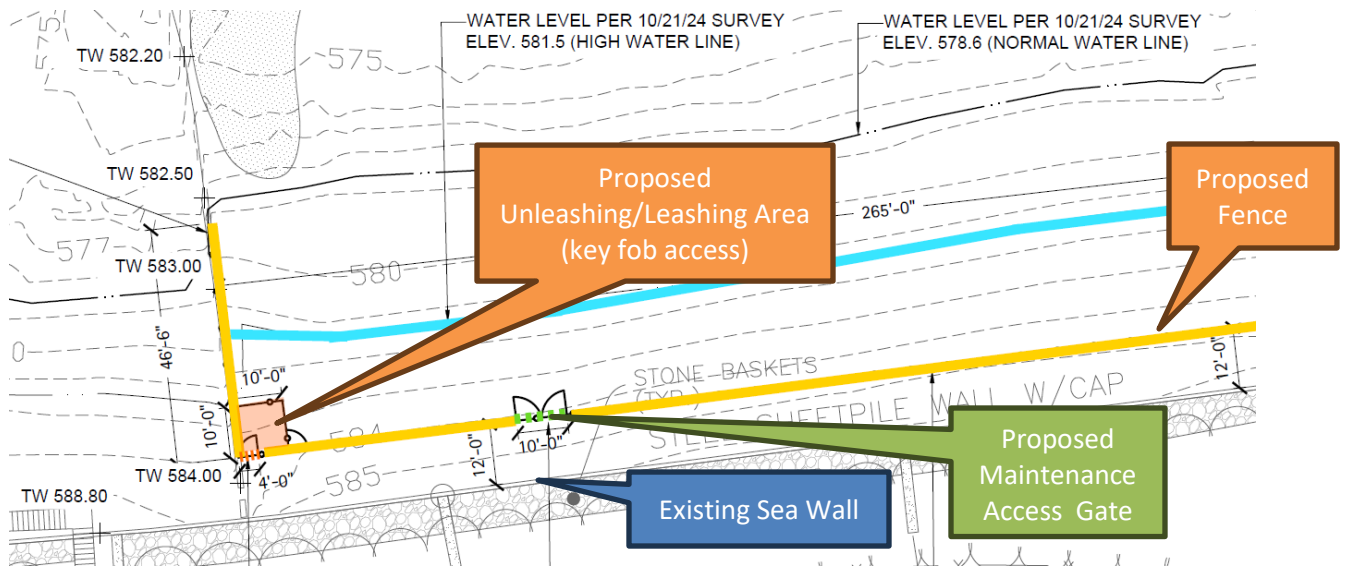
New Plan - North and West Portion of Proposed Fencing (Excerpt of Sheet L2.0)
